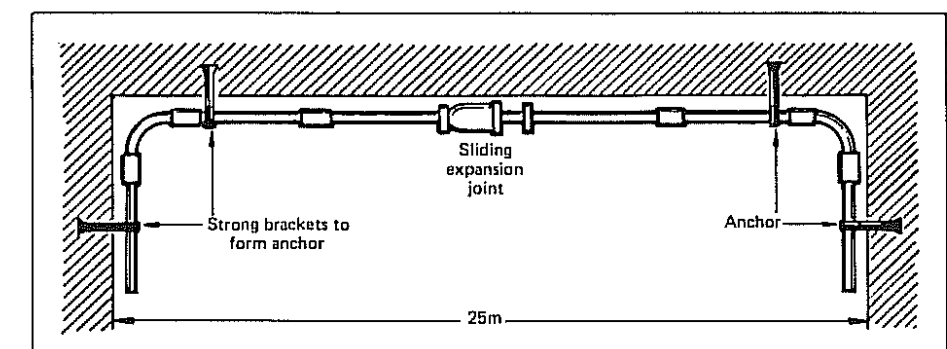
Method of fixing long lengths of pipework along a wall (Sliding expansion joint)
